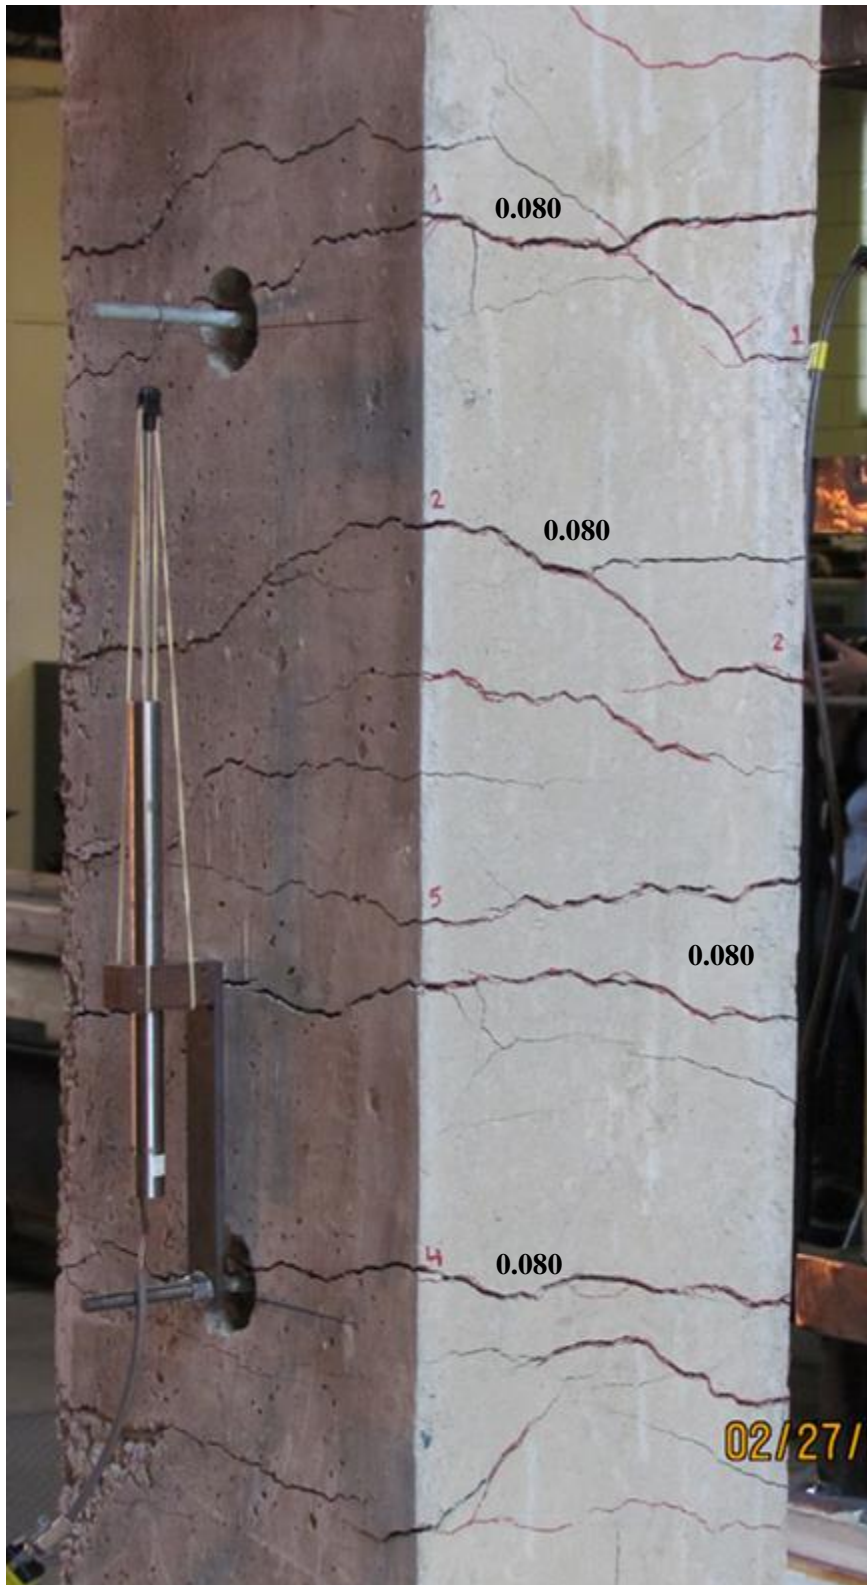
Cracks on north-west face of TS02 at Load Step 23
